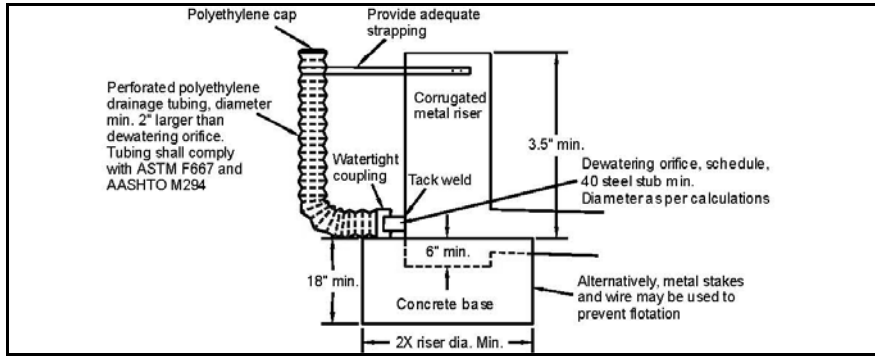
SEDIMENT POND RISER DETAIL
